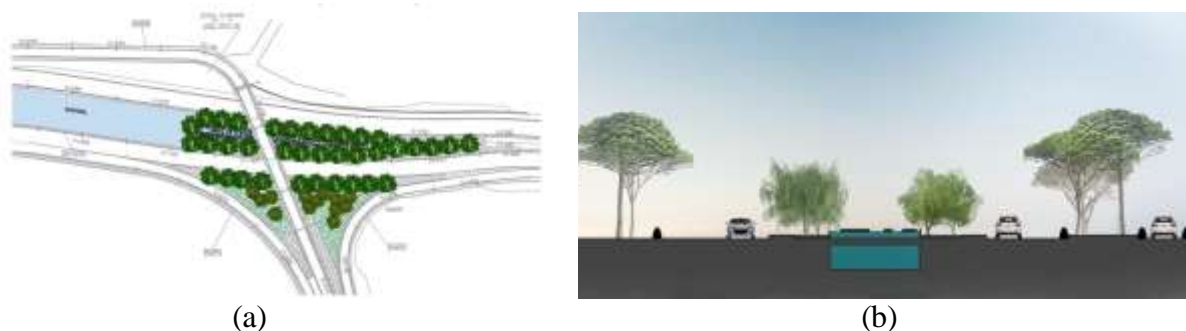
First intervention area: Metn El Sarih Entrance. (a): Plan (b): Section
